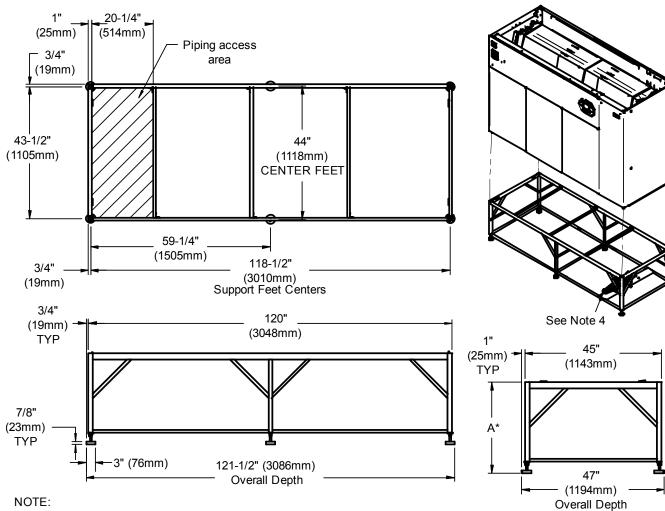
Floor stand and floor planning dimensions, downflow models CW146 and CW181 with EC fans
